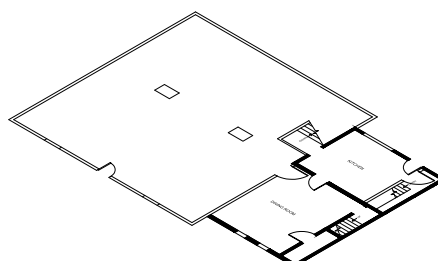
Pryor House, Phase II, ca. 1877, after first alteration. Detail of 1881 bird's eye with conjectural first floor plan. This addition removed the former kitchen and leanto. A doorway between the dining room and the main house may have been through what is now a glass-faced china cabinet, whose surrounding trim matches other doors in the room. Access to the storage and work areas in the basement would have been much as they were in 1874: either via the still extant staircase in the south west corner, which now would have been accessible through the new kitchen; or via the staircase in the southwest corner of the main house possibly now accessed through the new kitchen.
